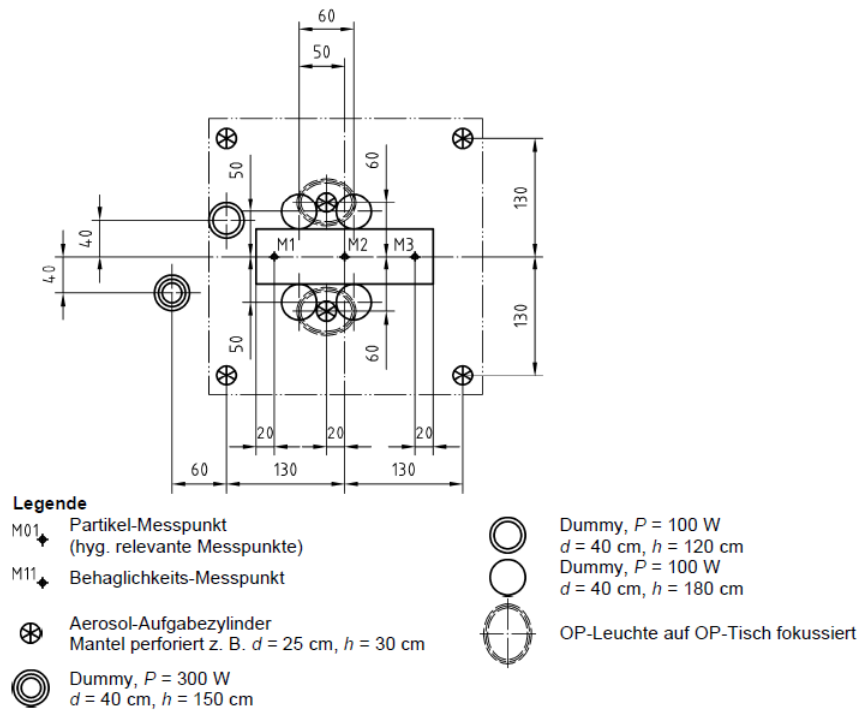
Reference load set-up for testing the protection against load entry from inside (from DIN 1964-4 [32]). Internal contamination layout
